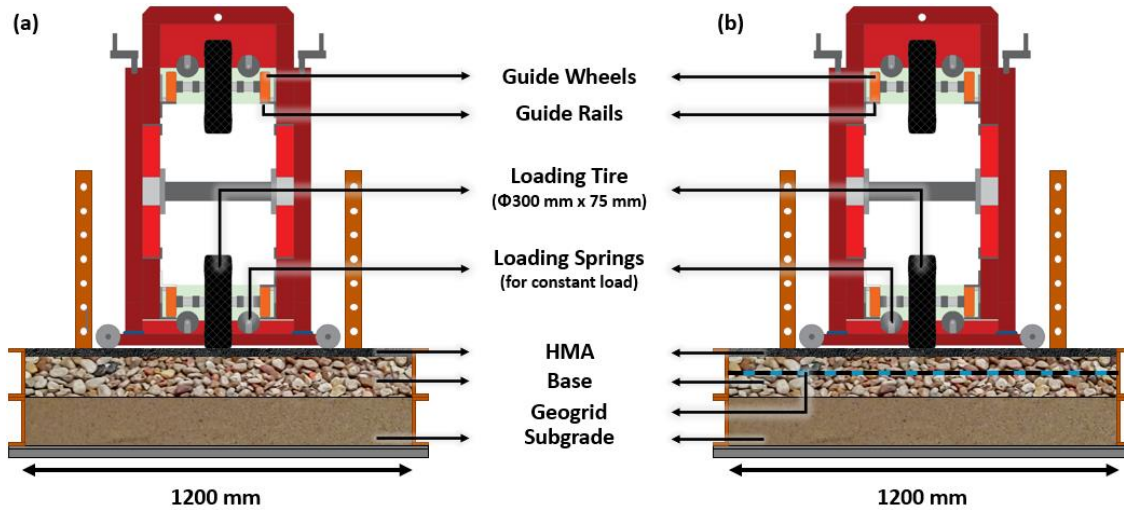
Pavement test sections used in this study: (a) Control I & II; and (b) Stabilized.
